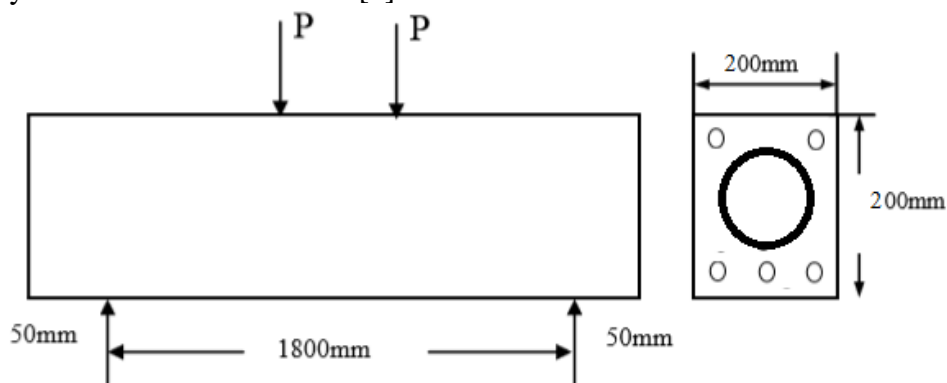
Schematic representation of hollow R.C. Beams Sections.
